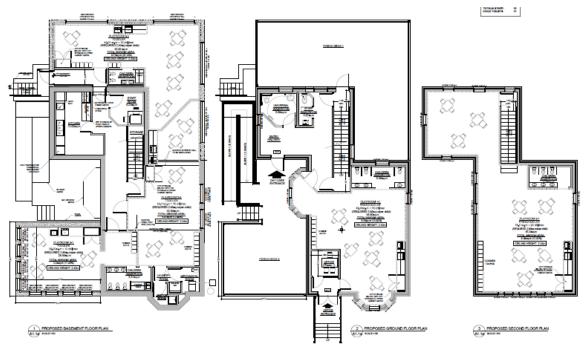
Floor Plans, Phase 1 Armstrong House Daycare (AREA, May 1, 2024)
